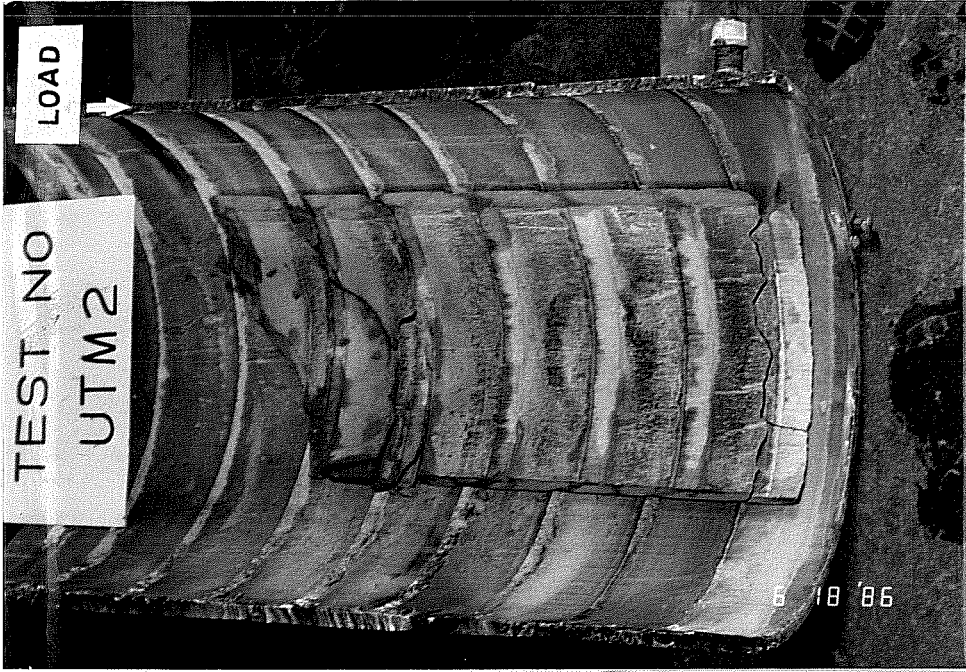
Grout surface on pile side for Specimen UTM2
